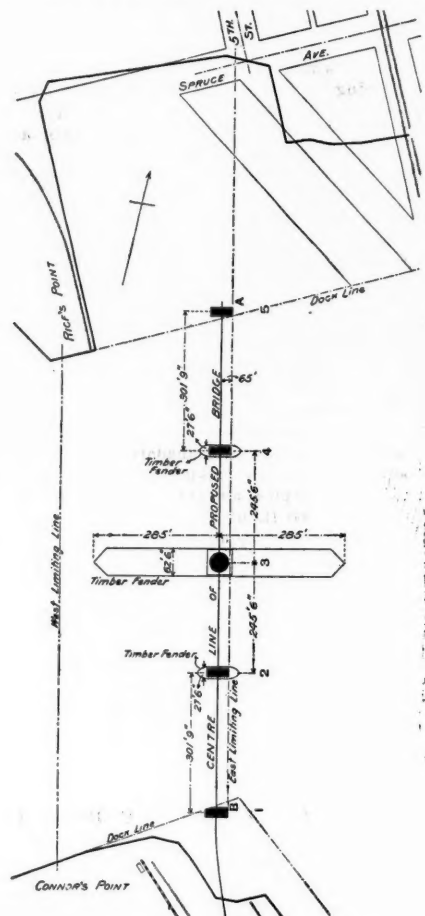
Plan Showing Location of Piers and Fenders of the Duluth Bridge.
